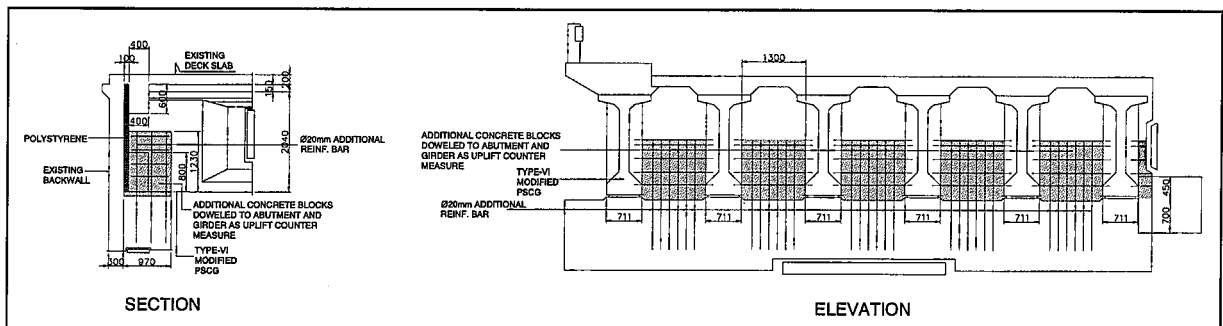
Additional Reinforcing Bars and Concrete Block at Abutment
